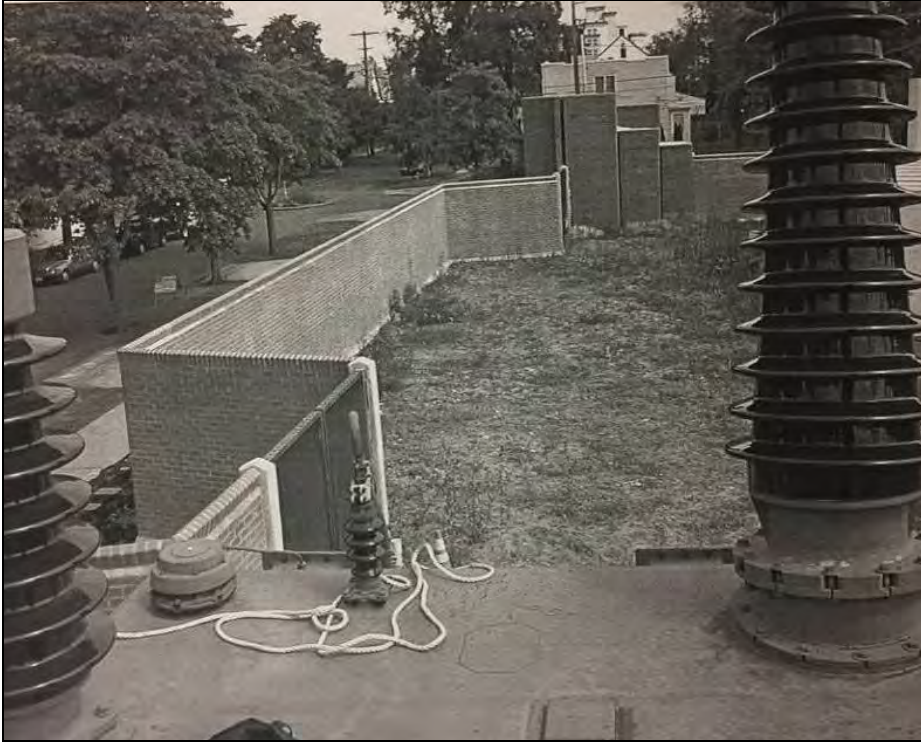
Left, a view toward the north, showing the northwest corner of the switchyard in ca. 2005, with the new straight masonry wall, placed west of the original wall (SCL Collection, ca. 2005).
